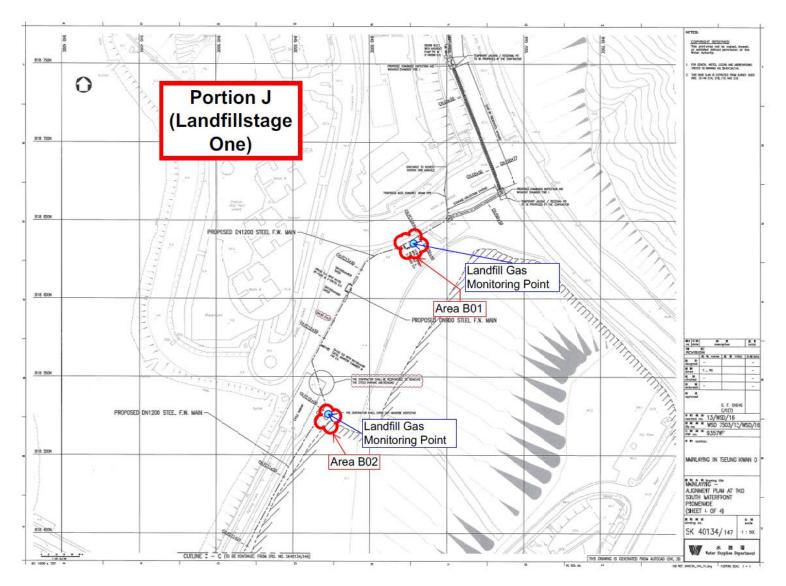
Location Plan for Portion J – Landfill Stage 1 (Area B01-B02)
